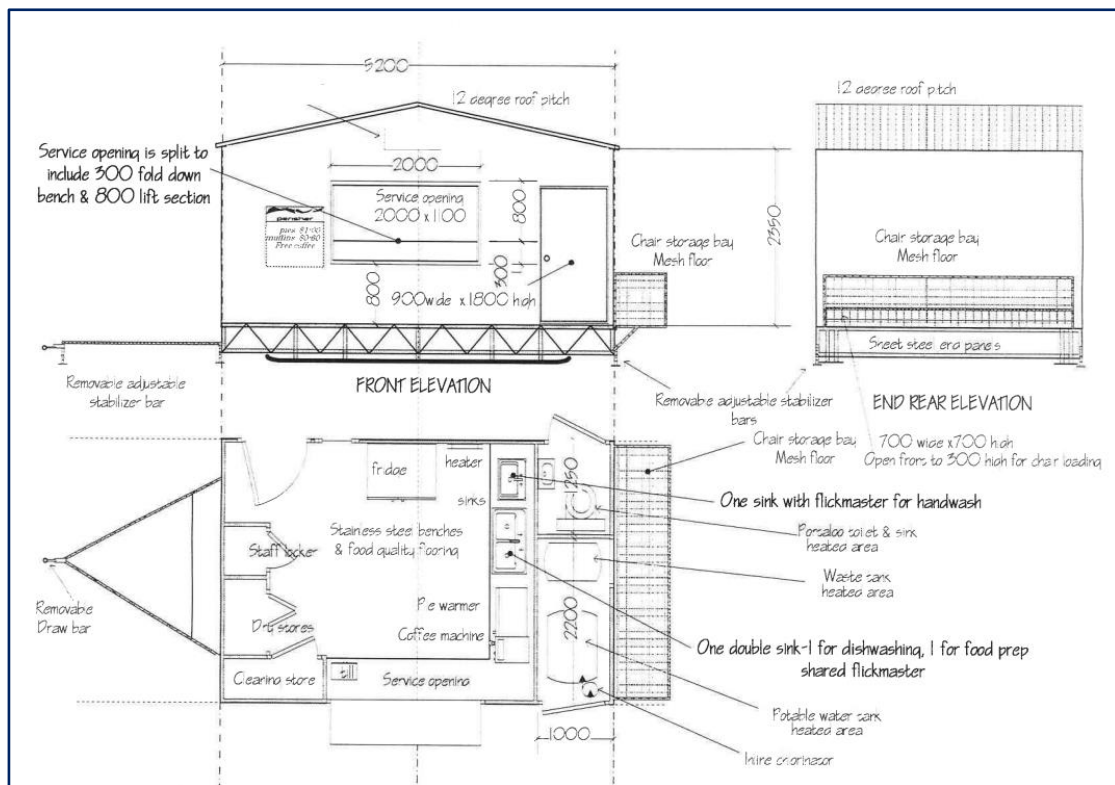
| Kiosk plan and eastern (front) and northern (end) elevations (Source: Applicant's documentation)
